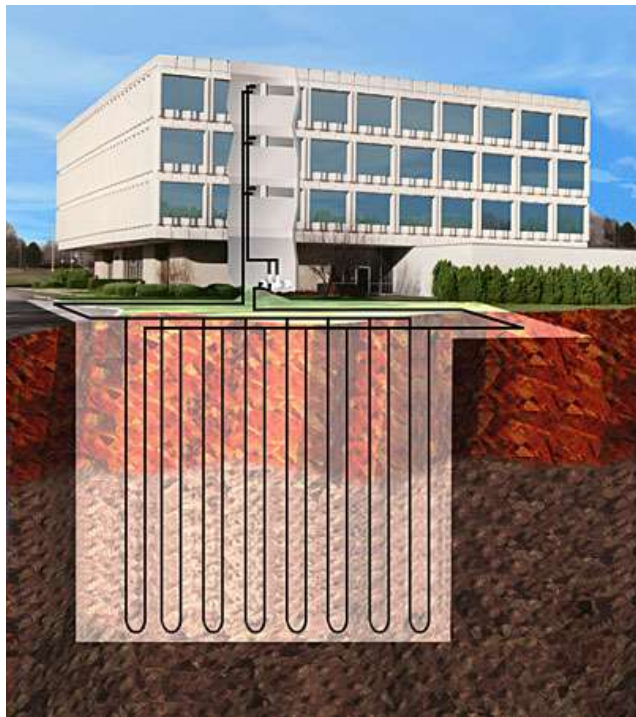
Vertical geothermal well field supporting a building is installed beneath ground features.
